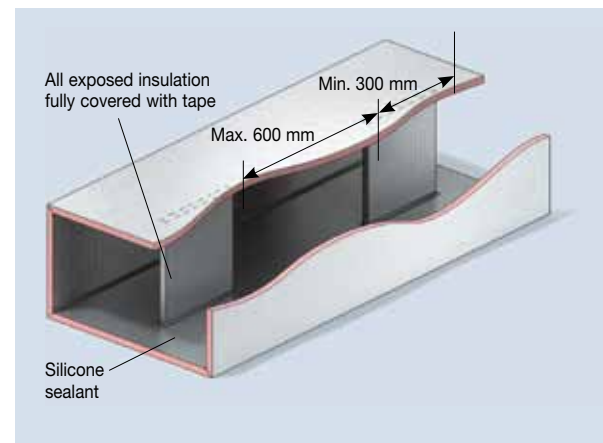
C.2 Kingspan KoolDuct® Panel Reinforcement
